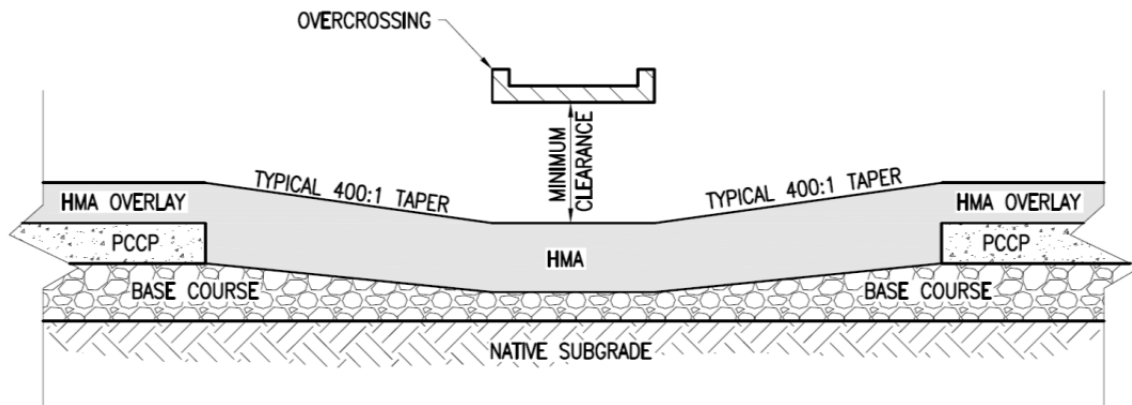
Illustration of flexible pavement transitions to overcrossings.
